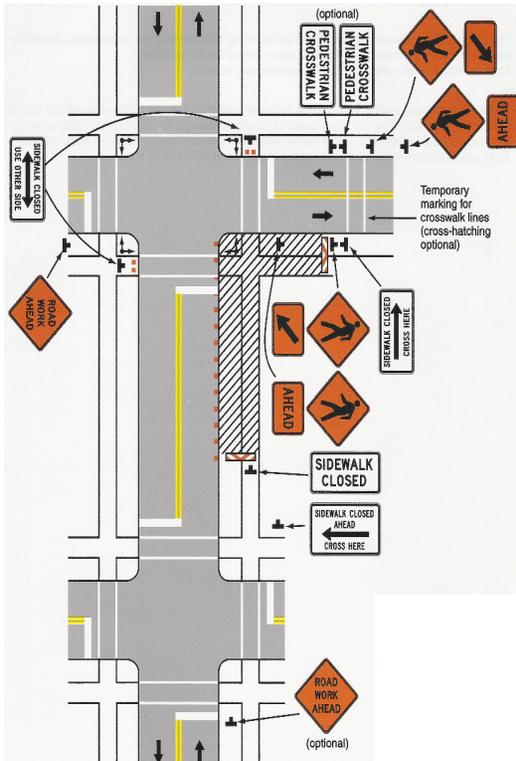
A sample signage plan to assist pedestrians using detours in construction zones. Adapted from Sample Signage Plan for Temporary Pedestrian Closure (MUTCD, Figure 6H - 29).
